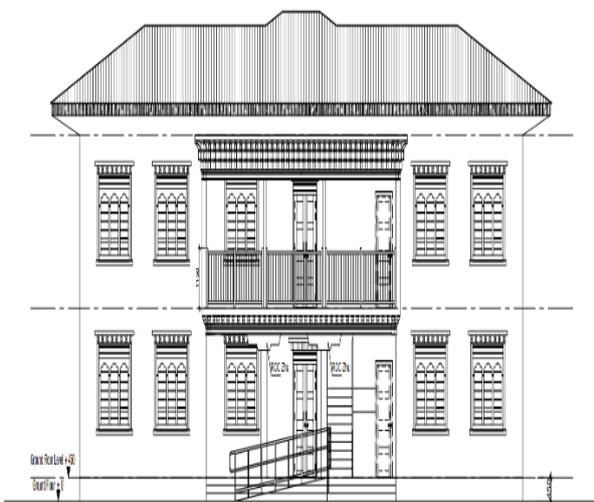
Inaccessible ramps constructed after the drainage, no ramps to access the first floor of the building
